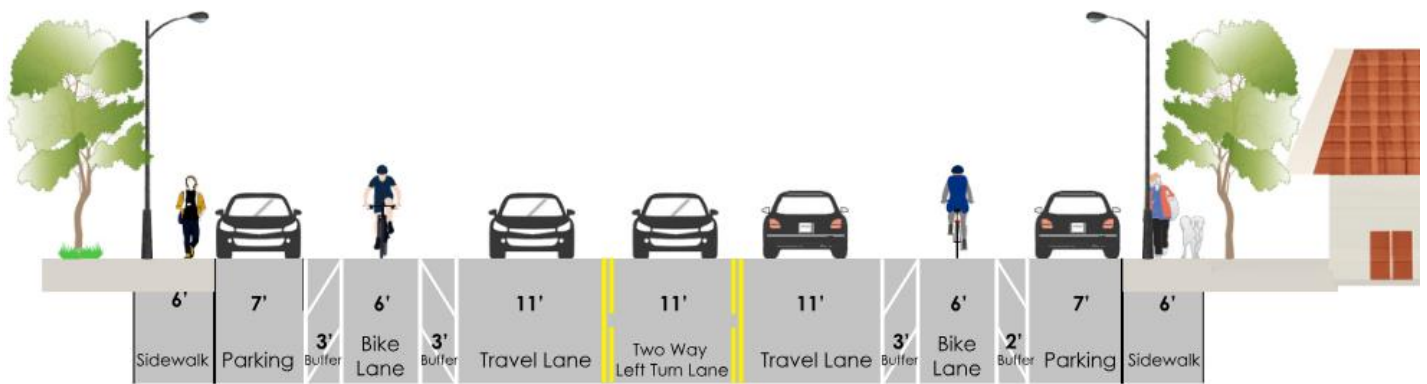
Lincoln Avenue/Rio Hondo Bike Trail Connection Concept
